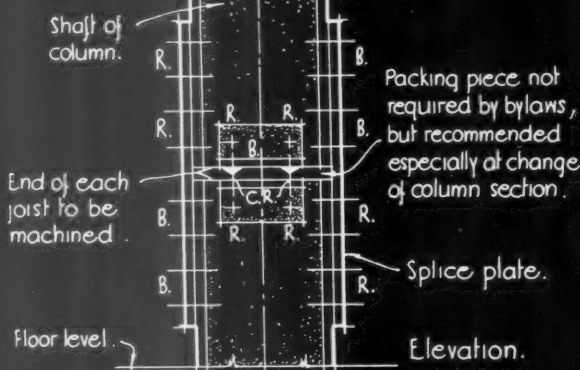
SHOWING SPLICE PLATES arranged to carry part of load in shear.
